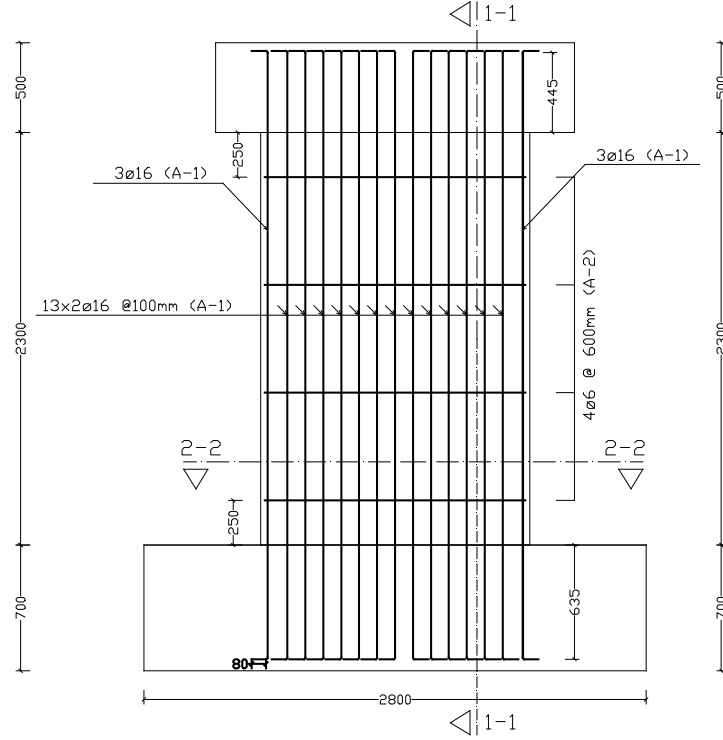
Transverse reinforcement. The stirrups in the test had a diameter of 8 mm.
